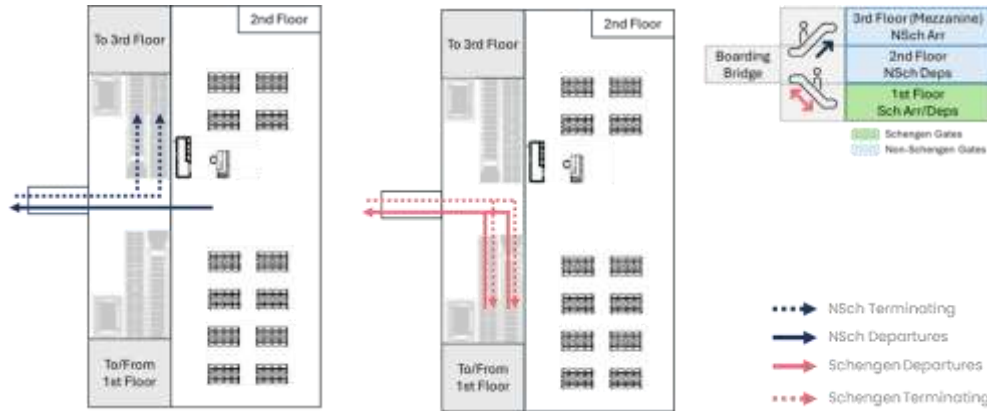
New Pier Holdroom and Preboarding Bridge Example
